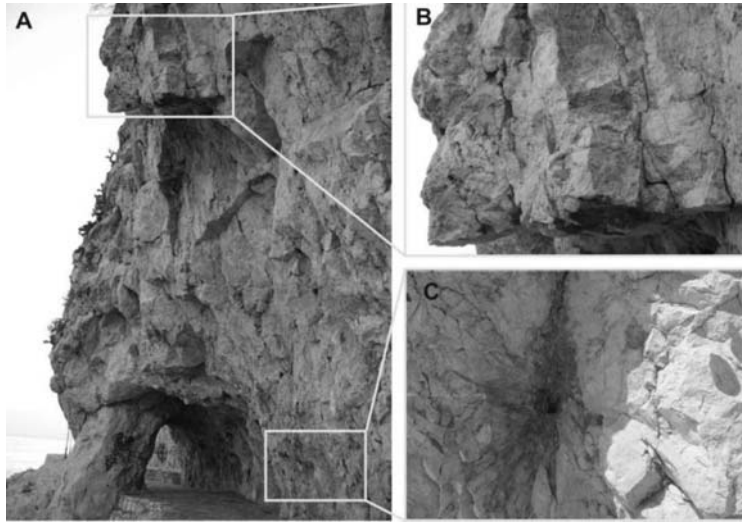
A) A small tunnel constructed along section C. B) Wedges hanged over the entrance of the tunnel. C) the intense artificial fracturing around a drill used for the installation of explosives.
